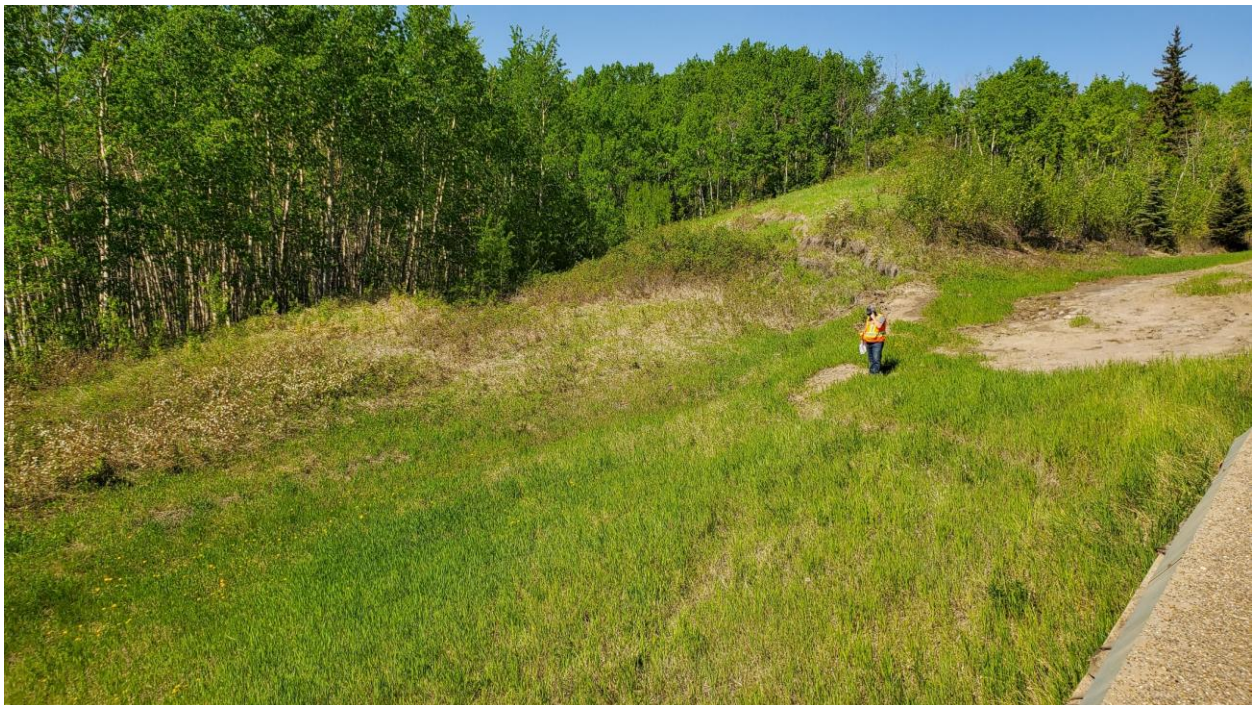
Looking west at graben block northwest of the wall, which appears to have become re-activated.
